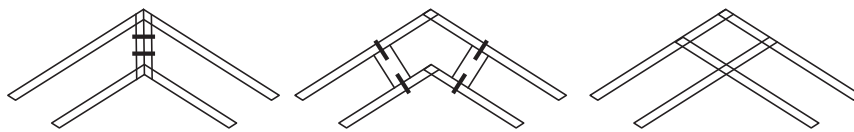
Prototype for a Snap-fit Jointed, Double-layered Corner (90° and 120° fold) - built from 17mm plywood, 75mm spacing. Note the double-snap-fit- element, which has a hook for the first layer and another hook for the second layer. The snap-fit joint in the middle is used as a spacer element. This technique can be used for structural improvement as well as for the fitting of (flocked) insulation materials.
